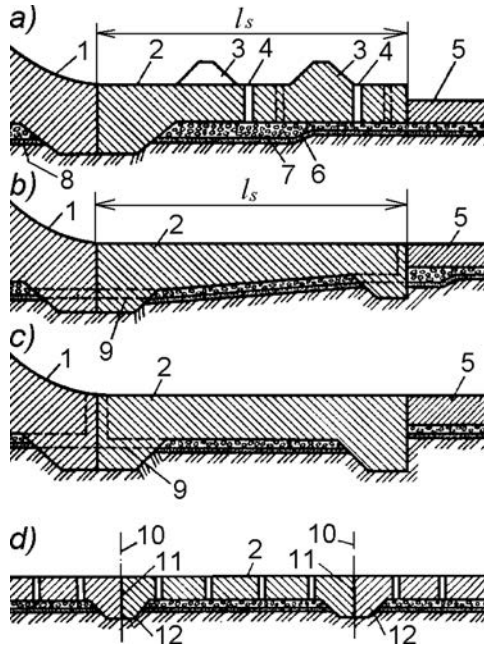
Structural scheme of the stilling-basin slab. (a, b, c) Longitudinal section of slab separated from the dam by means of a joint; (d) cross-section. (1) Dam; (2) stilling-basin slab; (3) teeth; (4) drainage openings; (5) riseberm; (6) drainage; (7) inverse filter; (8) drainage below the dam; (9) pipe for draining the water of the drainage below the dam; (10) axis of draining walls; (11) joint; (12) tooth.
